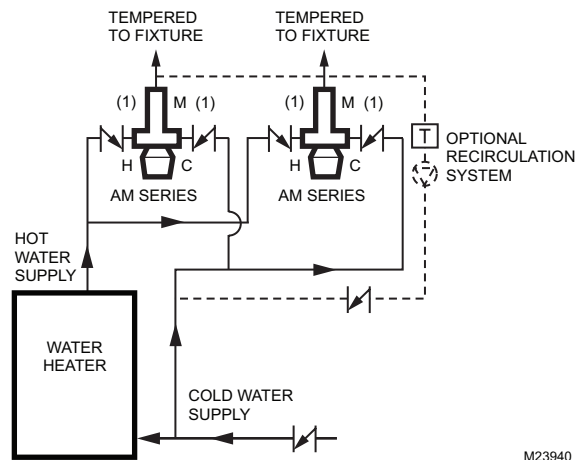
AM Series ASSE 1070 - Handless Fixtures
